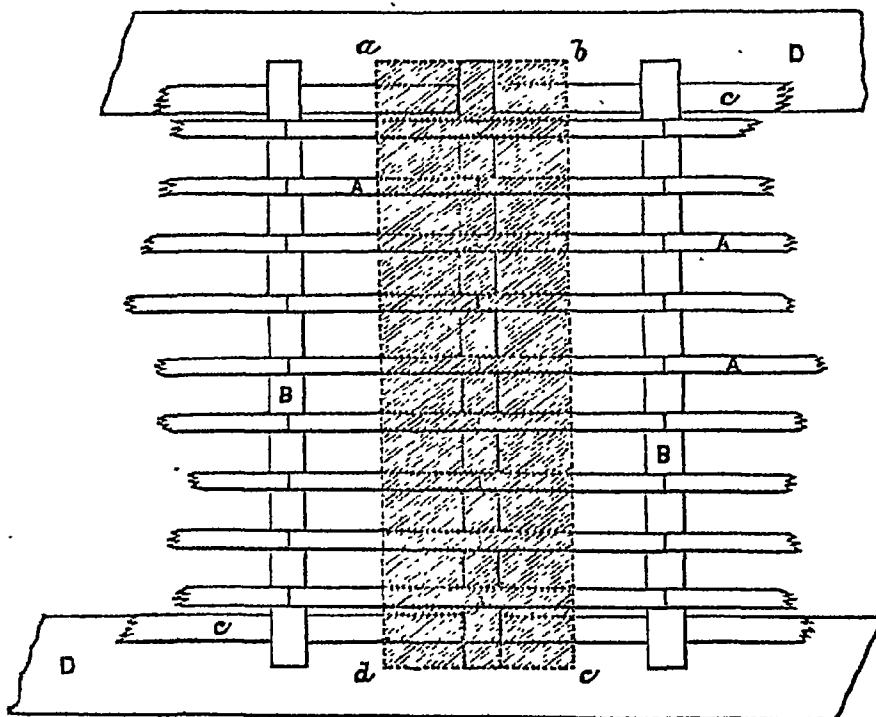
shows the area of pressure on a beam of a terraced roof. The shaded area $a b c d$ is supported by one beam. A, A are burgahs; B, B are beams; C, C are the wall-plates, and D, D walls. Scale 4 feet = 1 inch.
